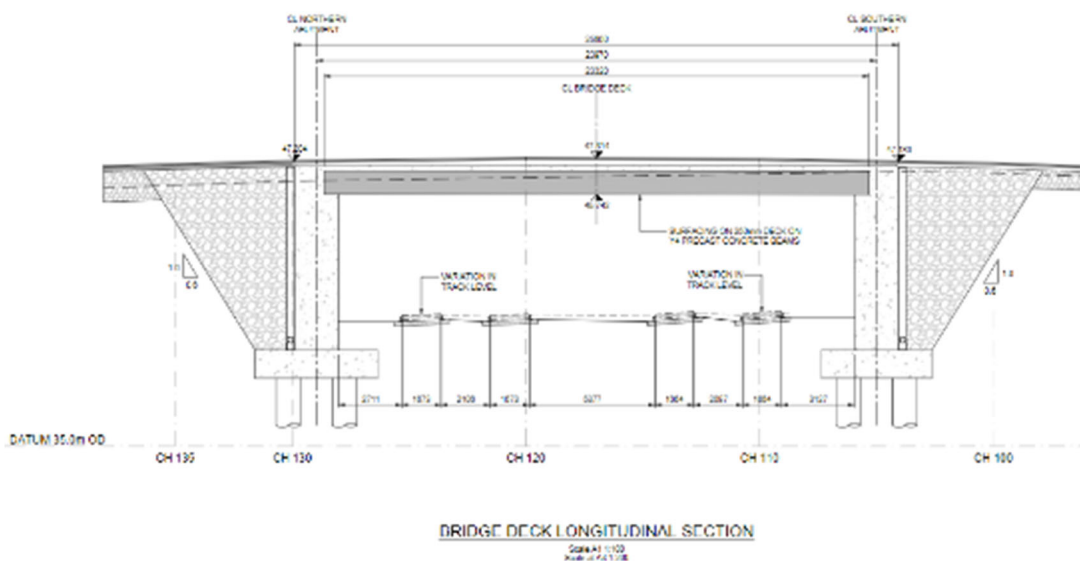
Le Fanu Road Bridge (OBC7) Bridge Deck Longitudinal Section – Facing East
